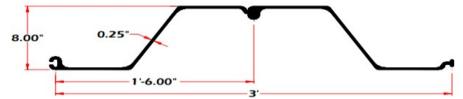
EverComp 26.1 Sheet Pile Cross Section (1 in =25.4 mm).
